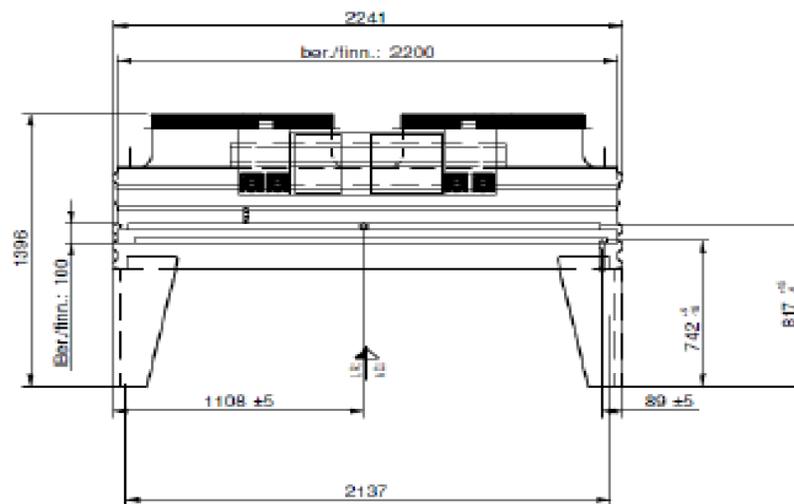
Collector End Elevation. (2no. required per 200kW heat pump)
